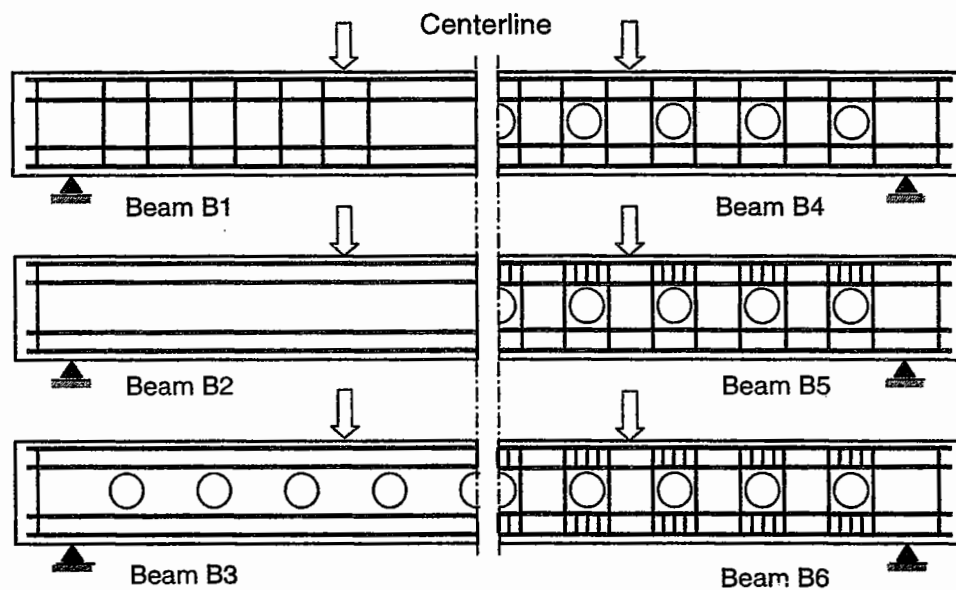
Reinforcement schemes for beams with openings (Salam, 1977).
